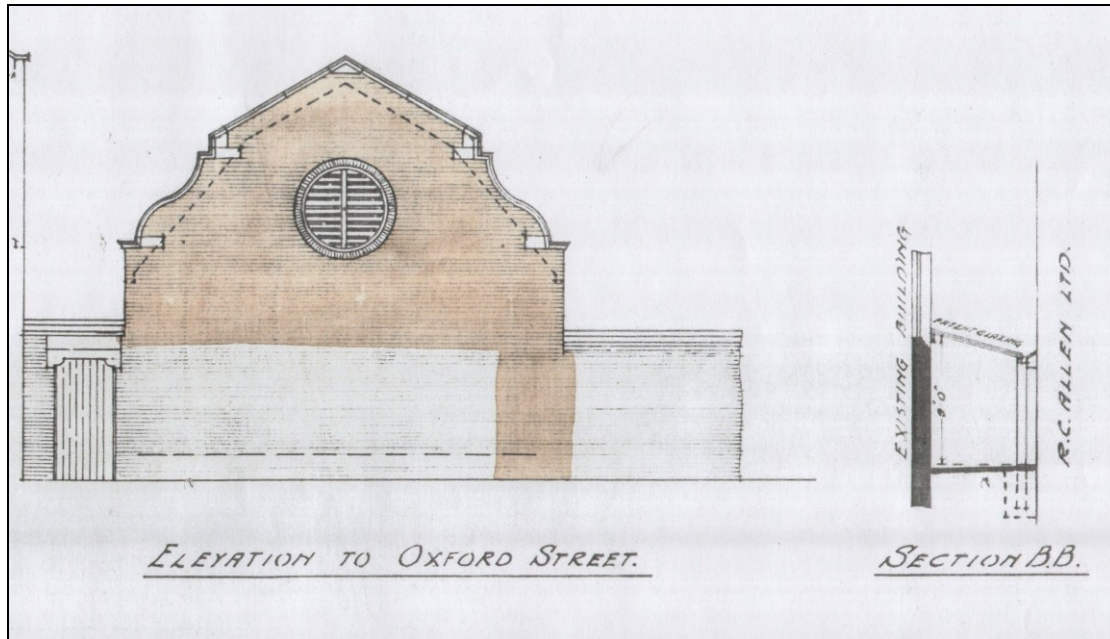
Original architects drawings of new art room for Newark Secondary School for girls. (LBR Plan 1927/34028. Not to scale).
